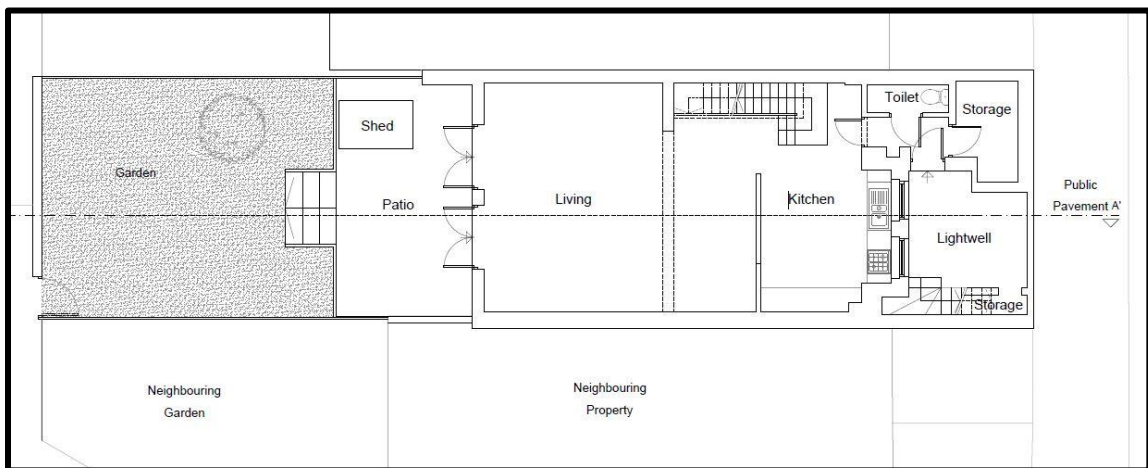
Existing Lower Ground Floor Plan - Flat 1, 3 Carlingford Road, Hampstead
